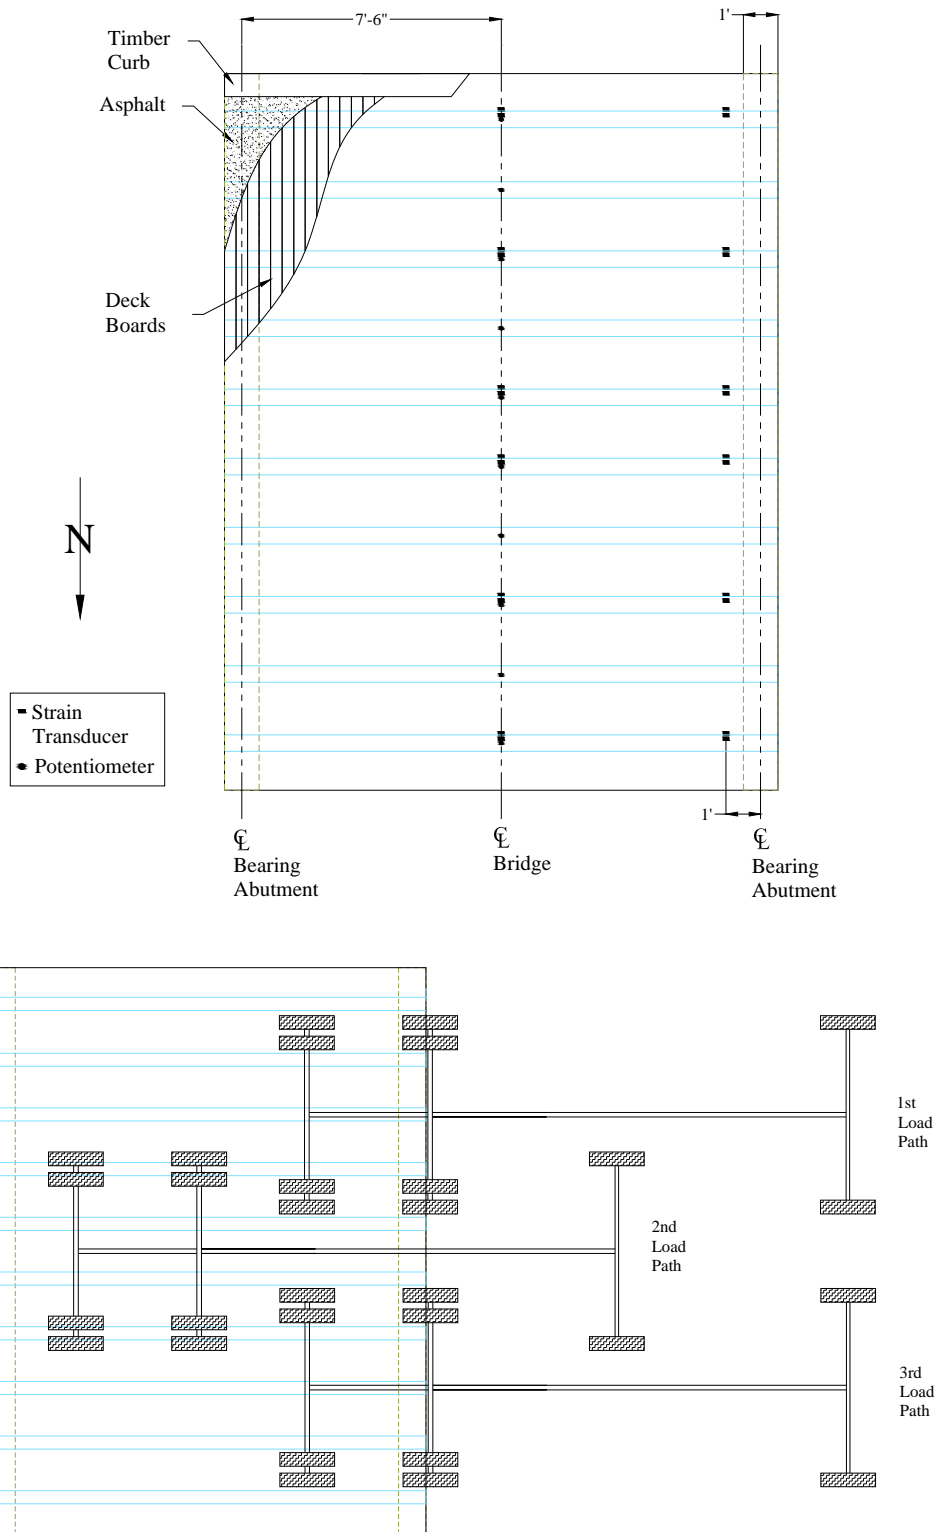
Instrumentation and Load Paths of Chestnut Cove Creek Bridge
